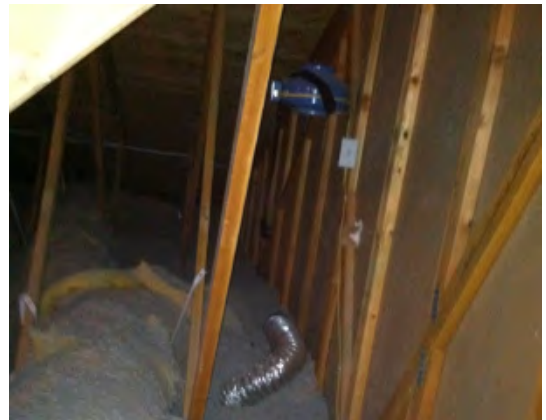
Disconnected bathroom exhaust fans noted in attic.
